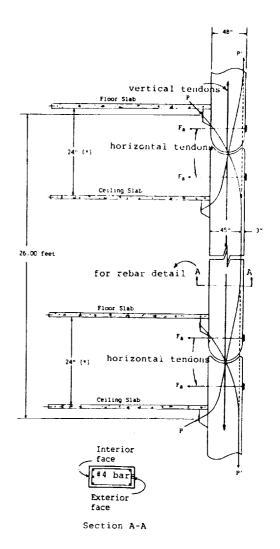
Exterior columns and connections. Note: (*) - 24" space between the floor and ceiling slabs is to provide room for horizontal tendons.
